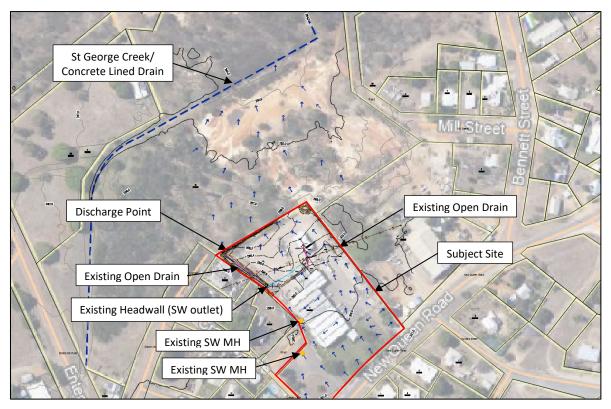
Site Topography and Existing Stormwater Drain within the Subject site.
